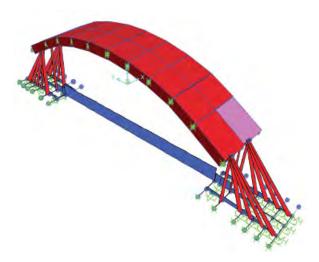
FEM Model of Colonial Parkway Arch. FEM modeling will help our team design and build a structure that is compatible with the existing arch.
